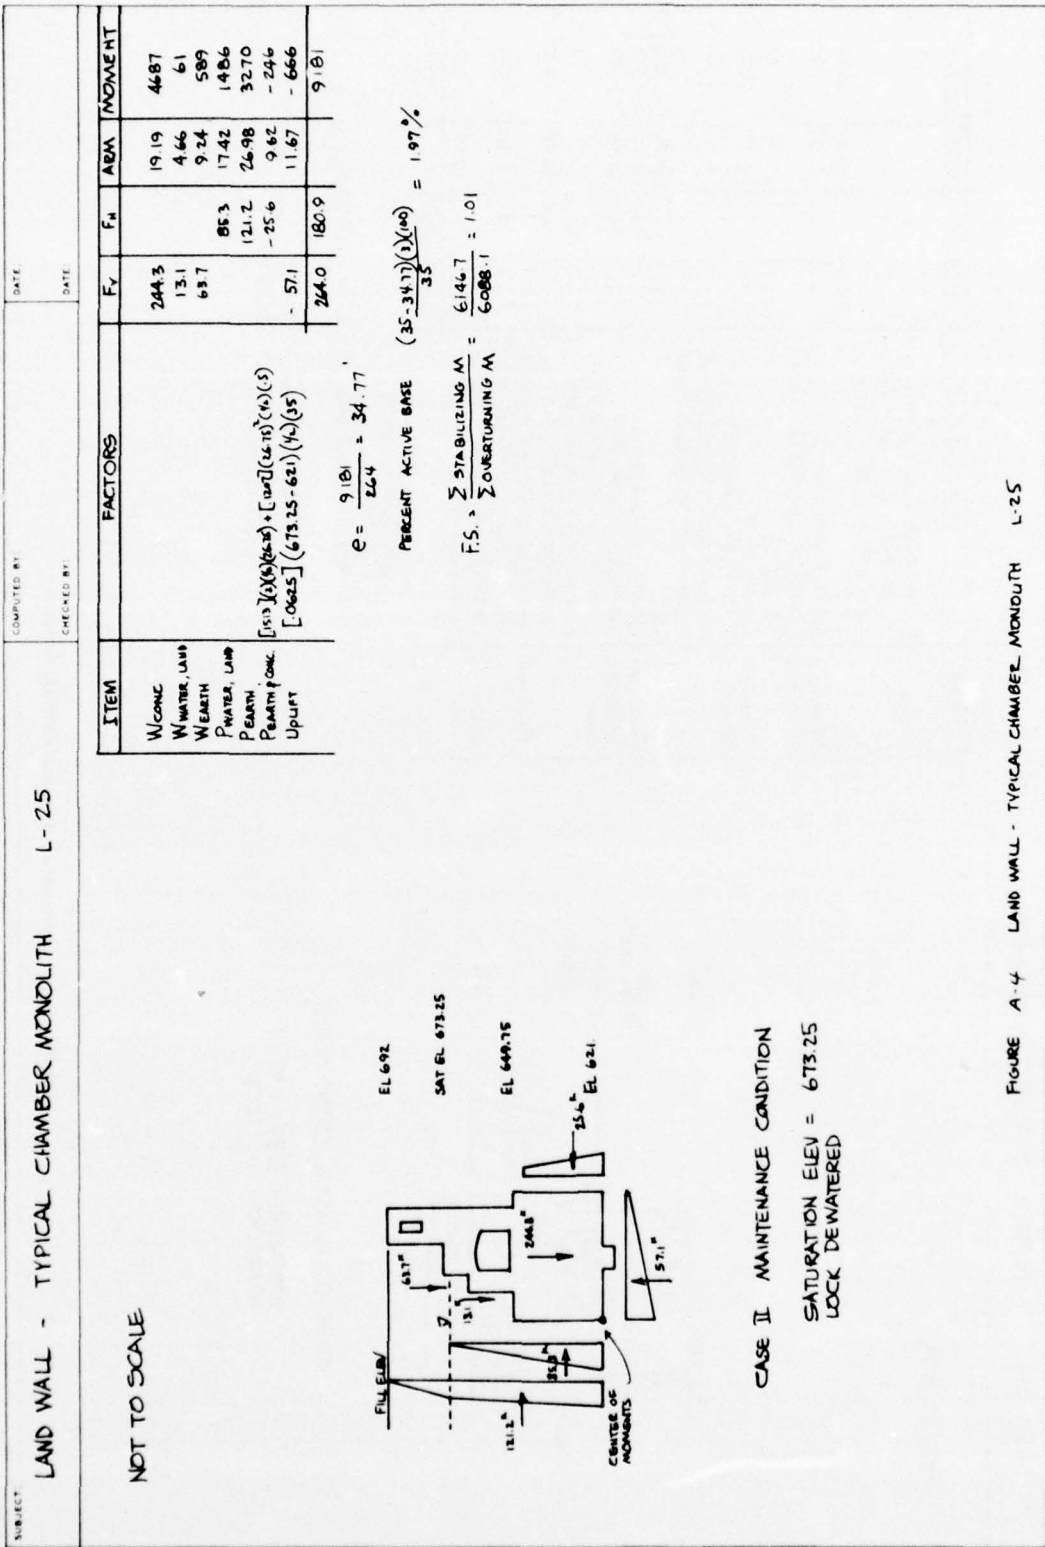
LAND WALL - TYPICAL CHAMBER MONOLITH L-25
